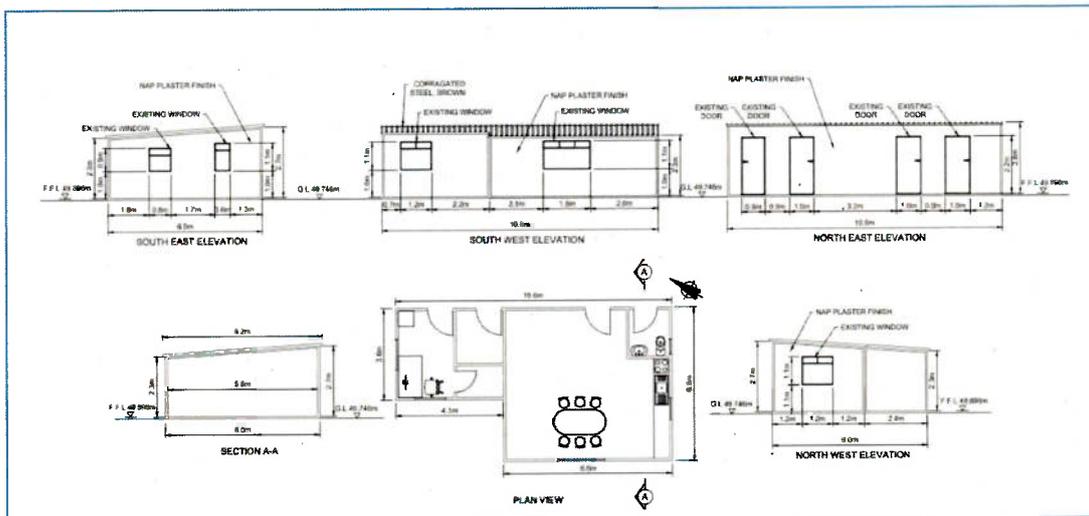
Extract from submitted drawing showing welfare-building footprint and internal layout
